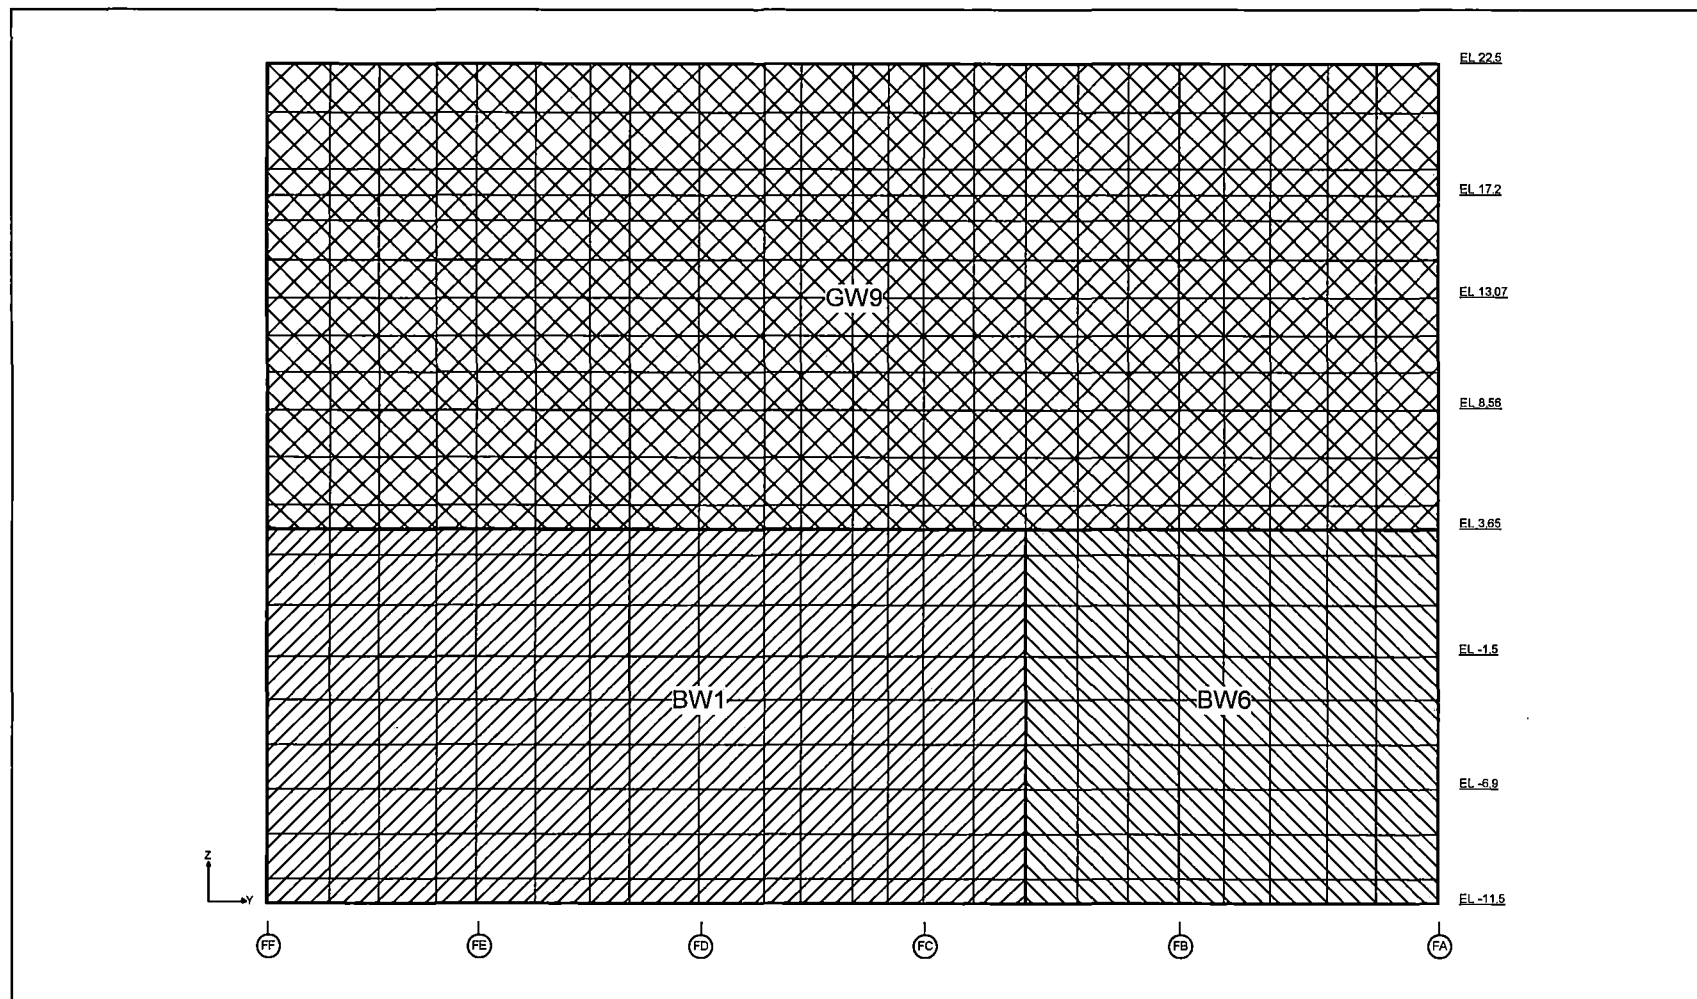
Application of Thermal Load on the External Wall (F3)
